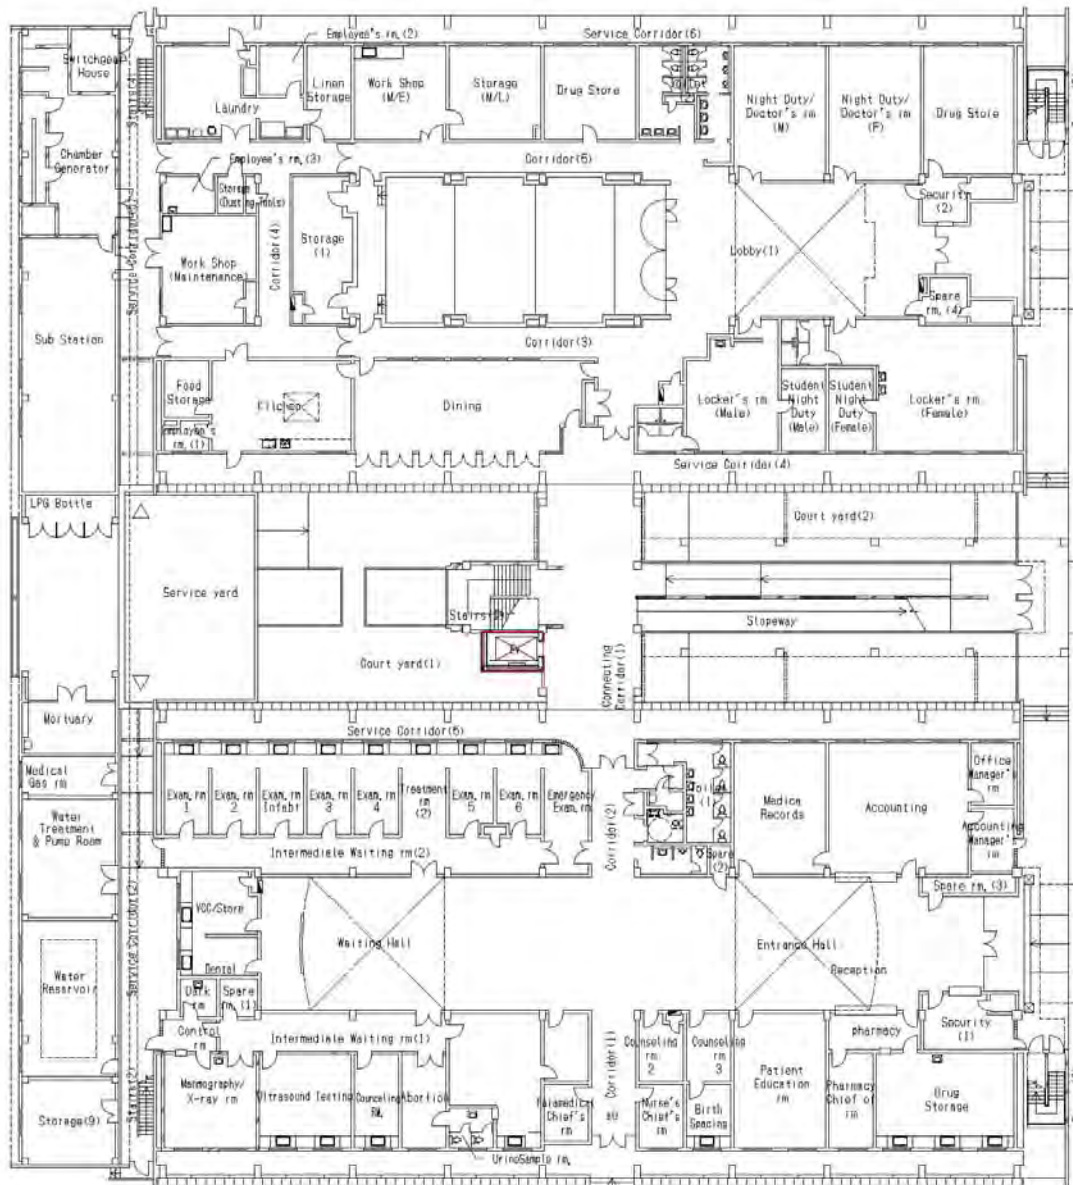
Renovated Existing Center 1<sup>st</sup> Floor Plan
